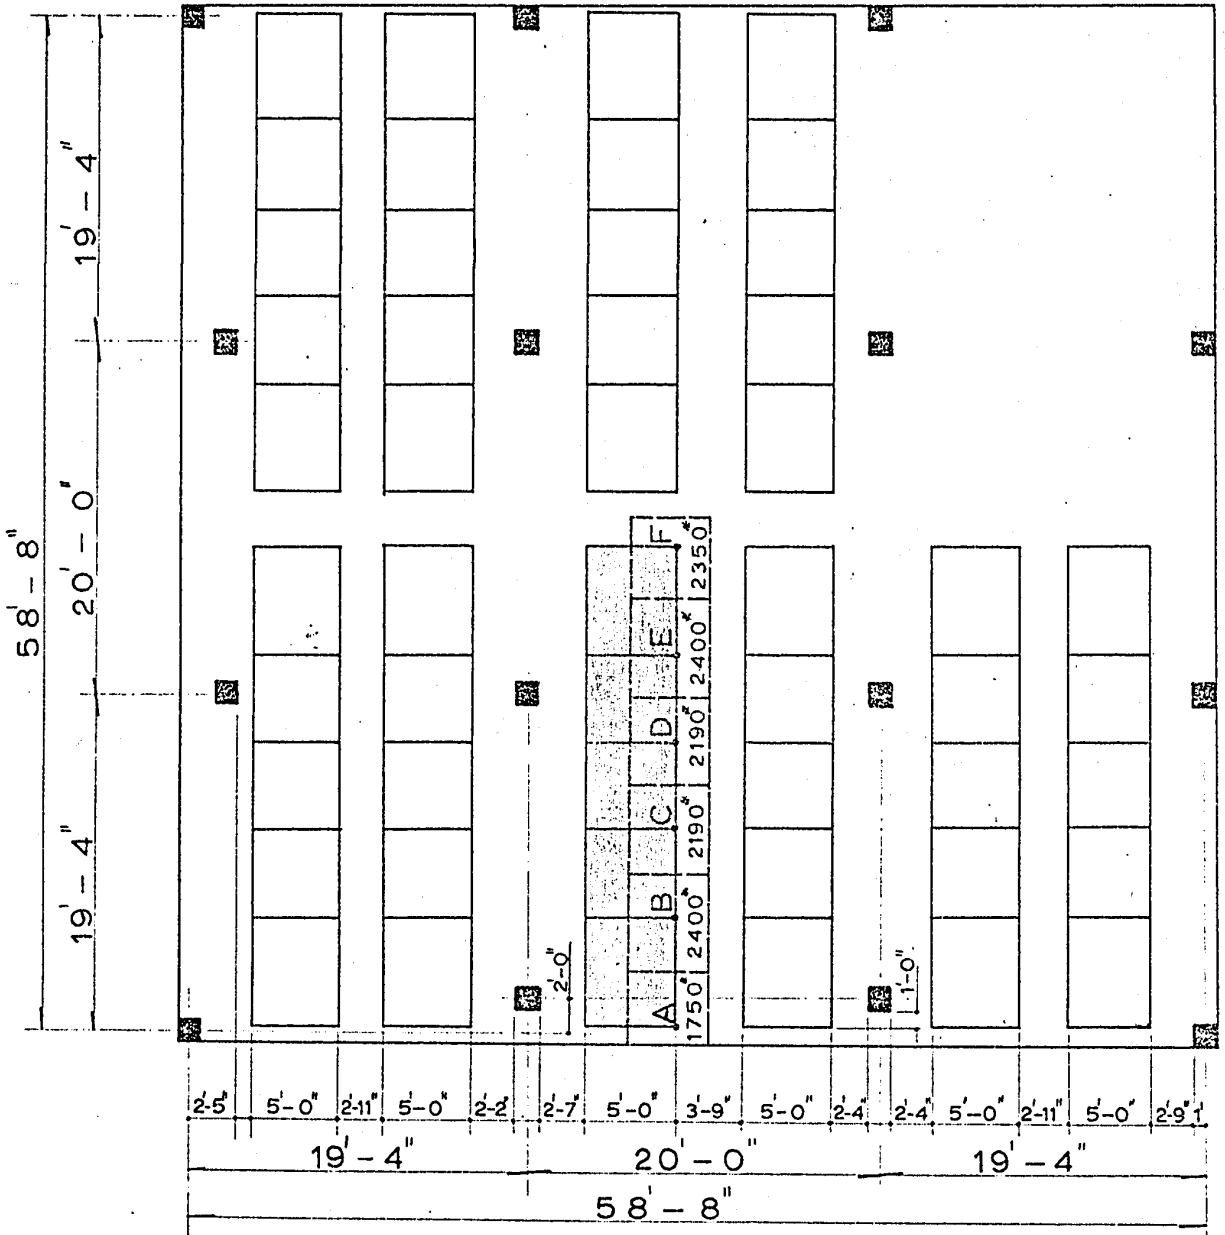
PART OF 7TH FLOOR PLAN OF
